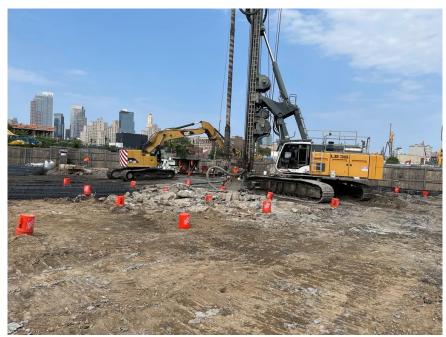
JEL installing a building foundation displacement pile in the southeast part of the site (facing north)
